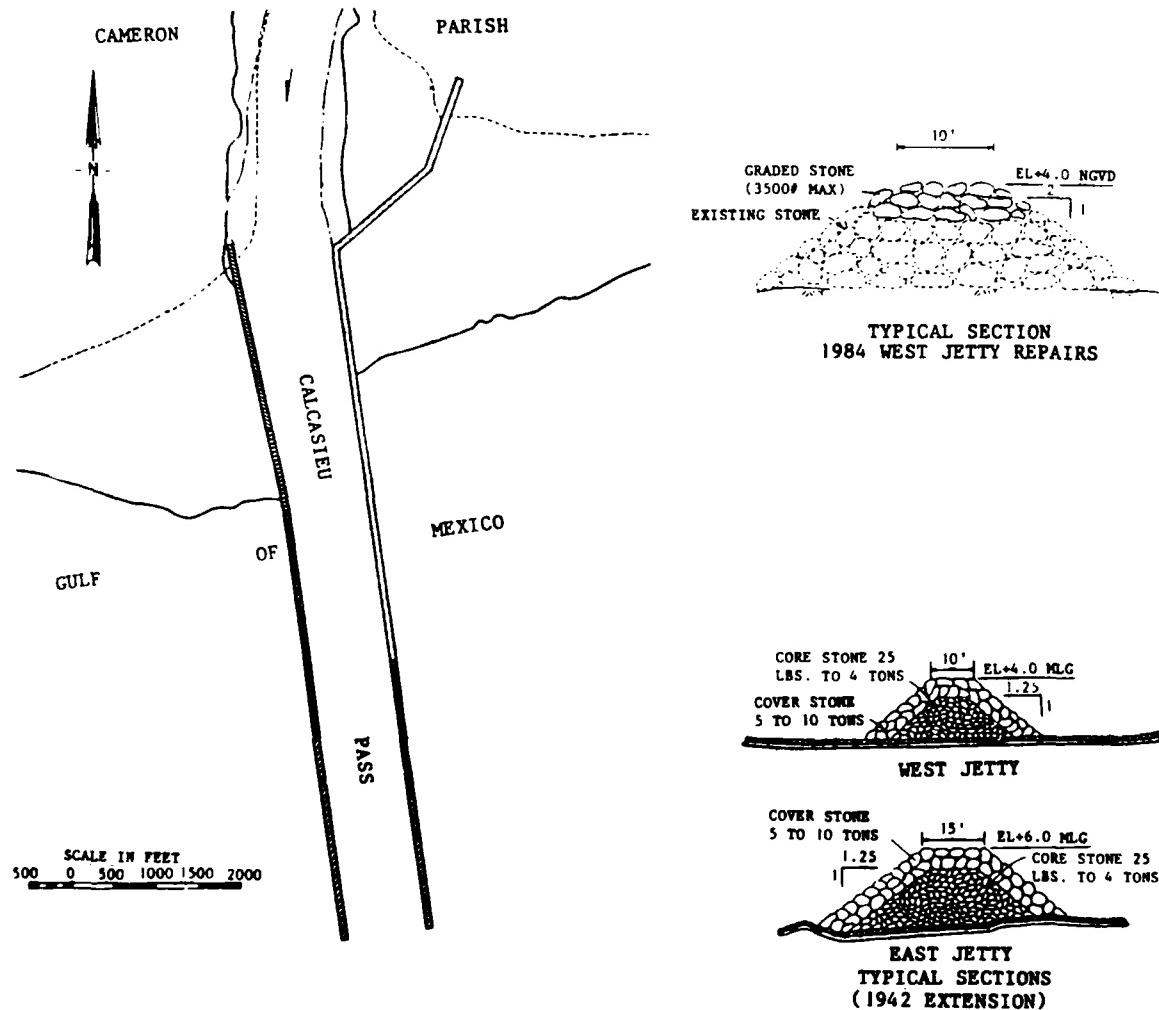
Plan view of Calcasieu Pass jetties and typical sections
